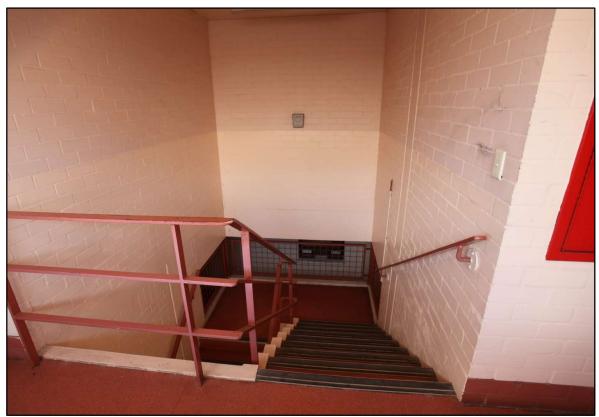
Stairwell showing steel balustrade (Block B- level 2)
